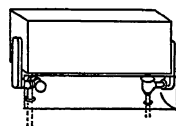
HEATING UNIT VALVES BEHIND GRILLE
